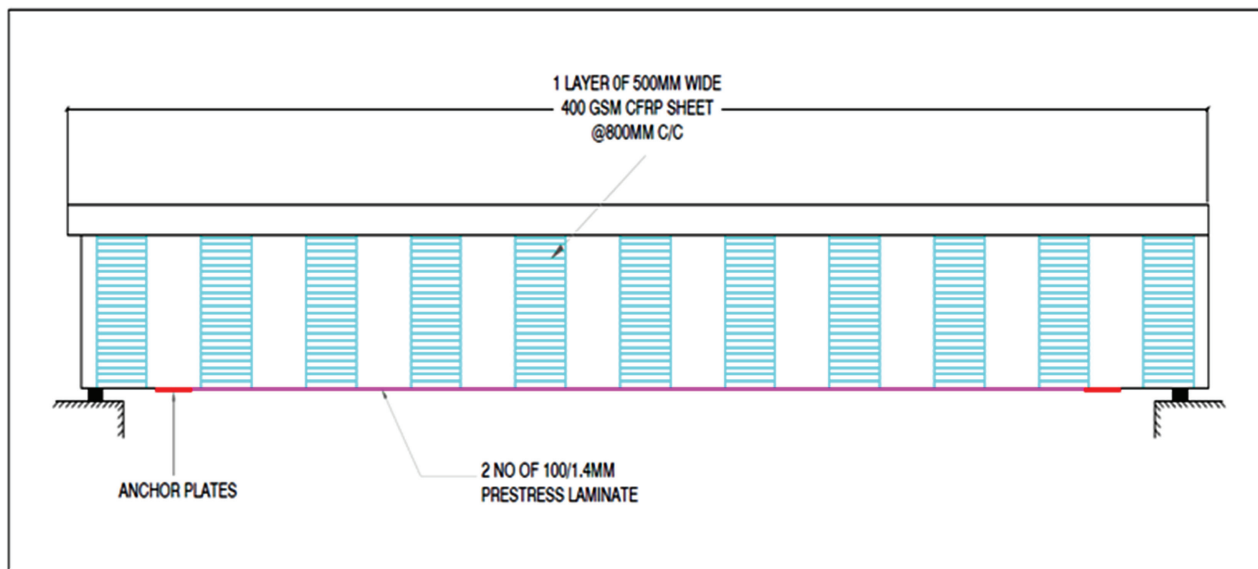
Strengthening of Girder with FRP Laminate and U-wrap (Side Elevation)
